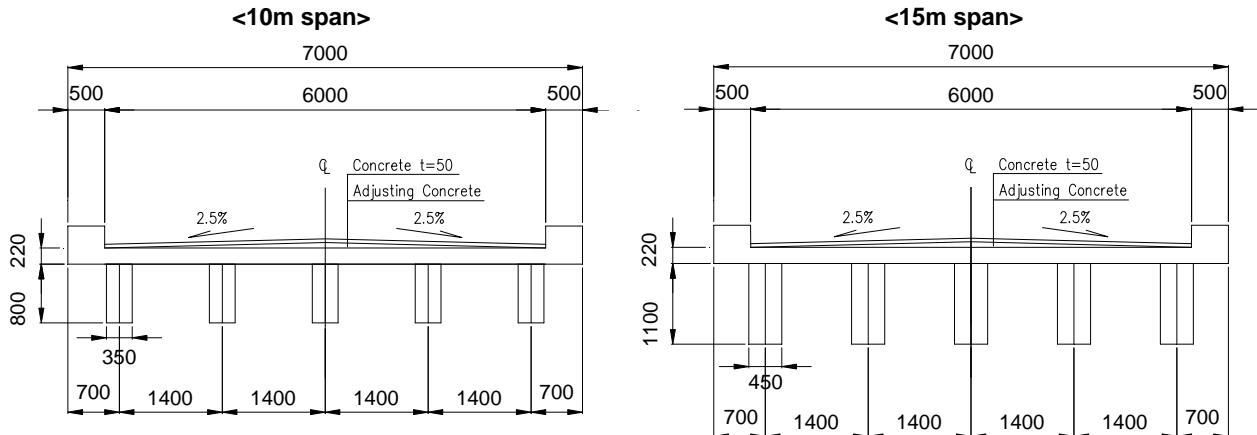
Plan of Bridge No.2 (Otwee – Wii Anaka Road)
